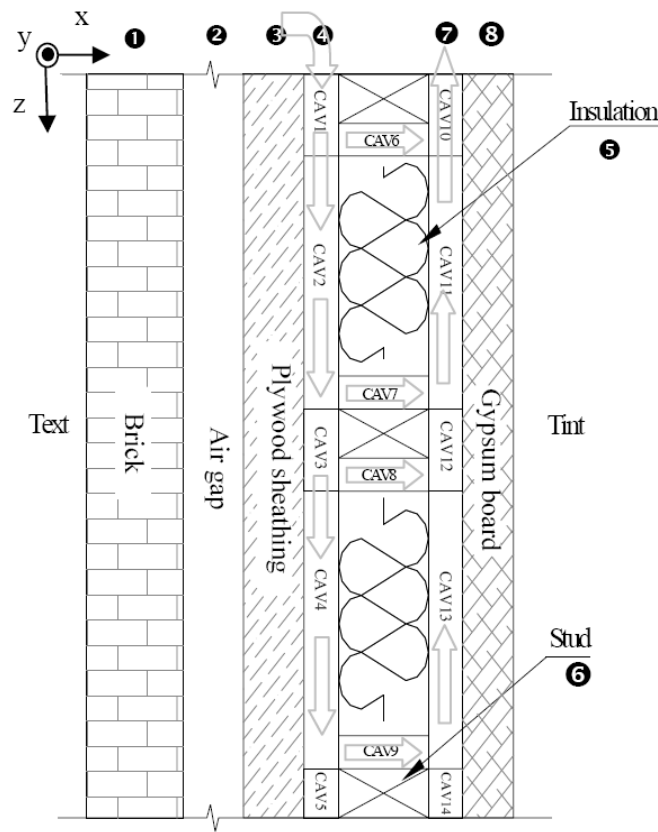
Horizontal Section of a Typical Brick Wall (Chebil, et. al., 2002)
